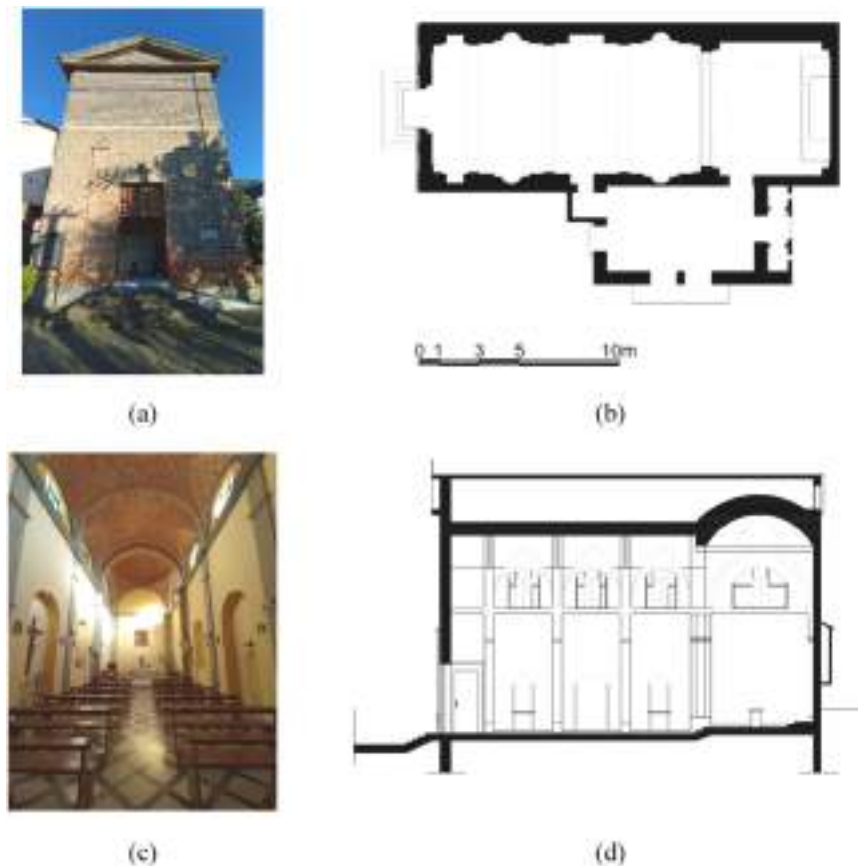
Photographic Documentation of the church of *Saint Maria di Montevergine*: a) Main façade; b) Ground floor layout; c) Nave; d) Cross-Section.
